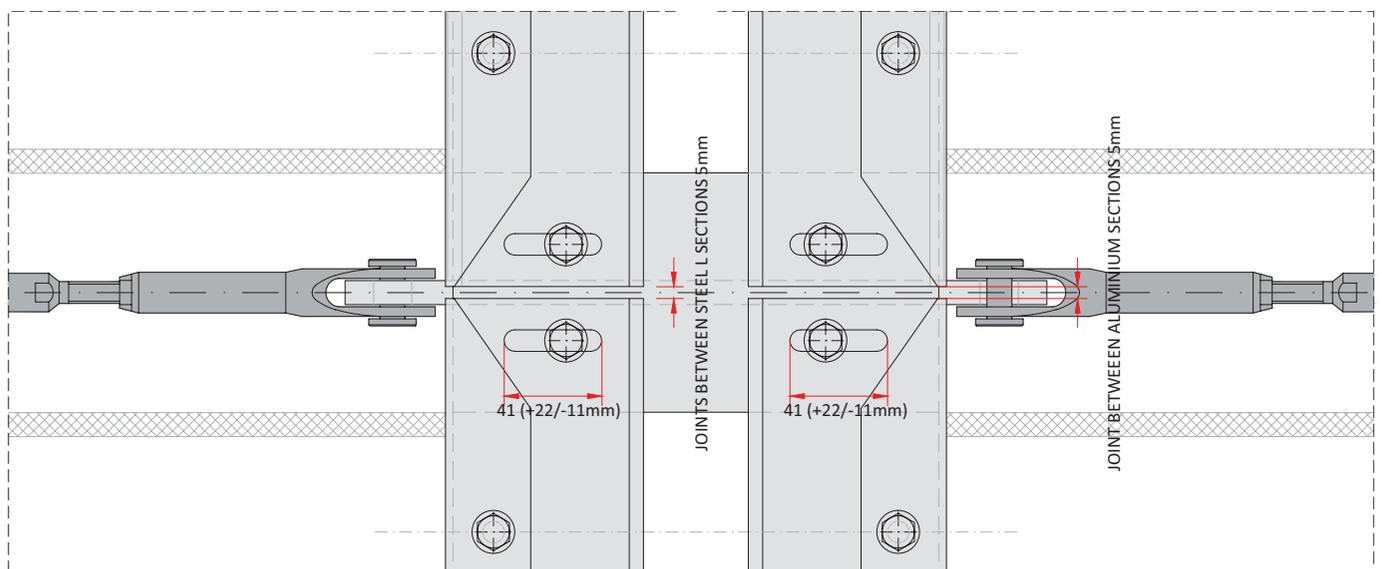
Tolerances for clamping detail – elevation; source: LEICHT
